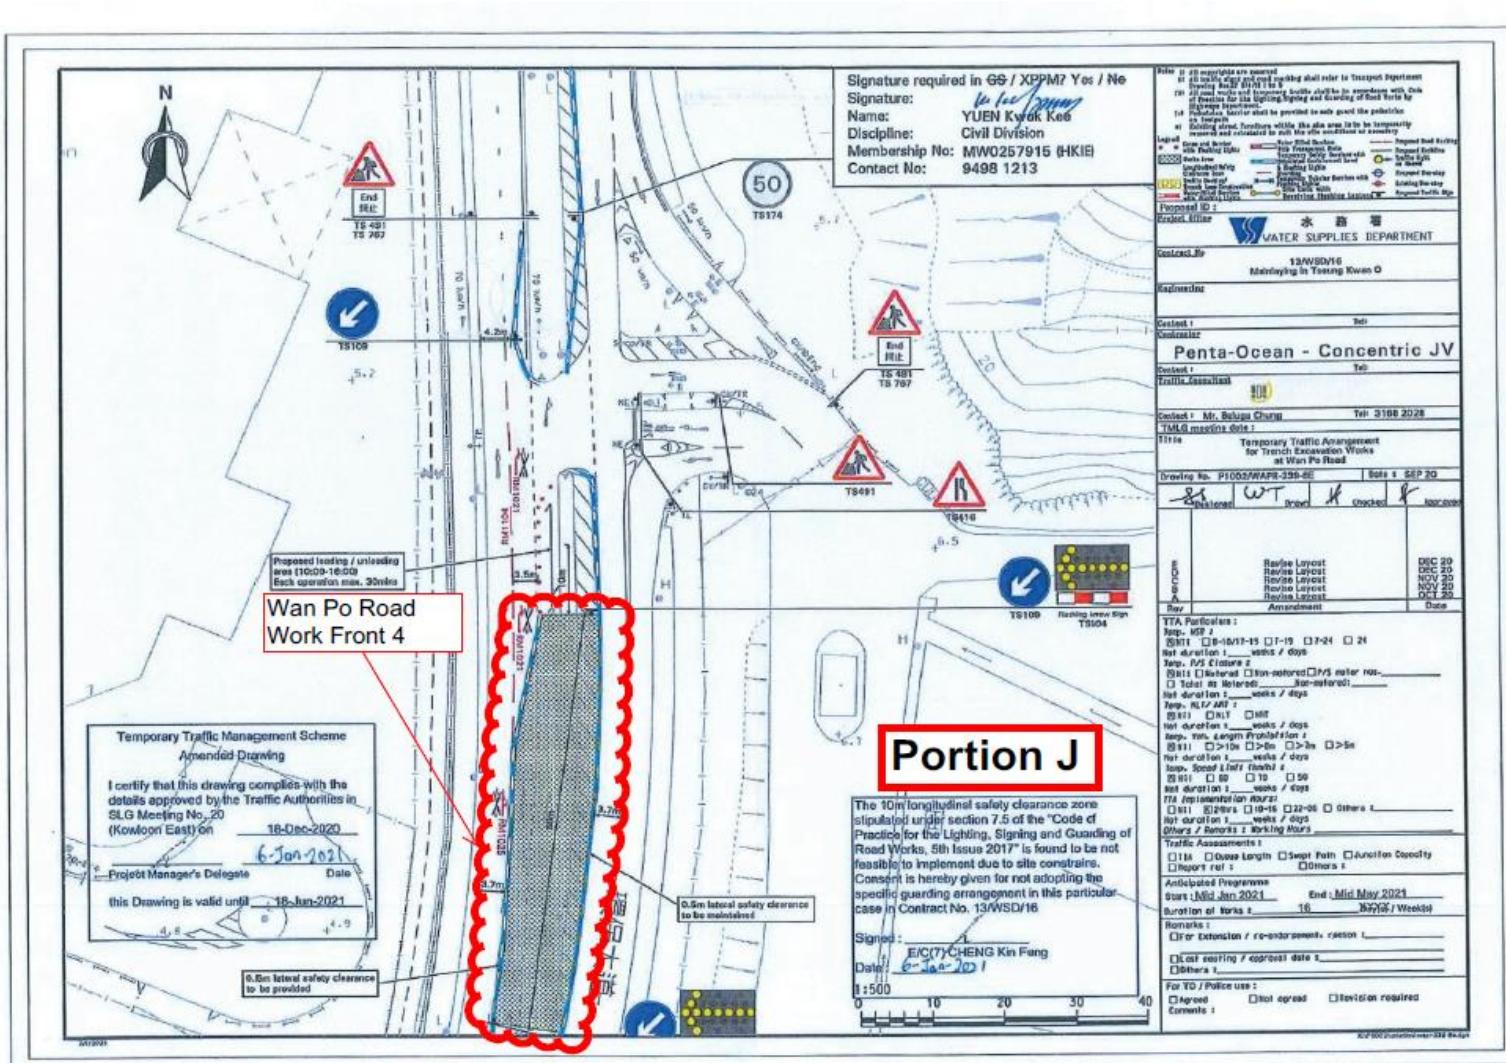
Location Plan for Portion J – Wan Po Road 4
